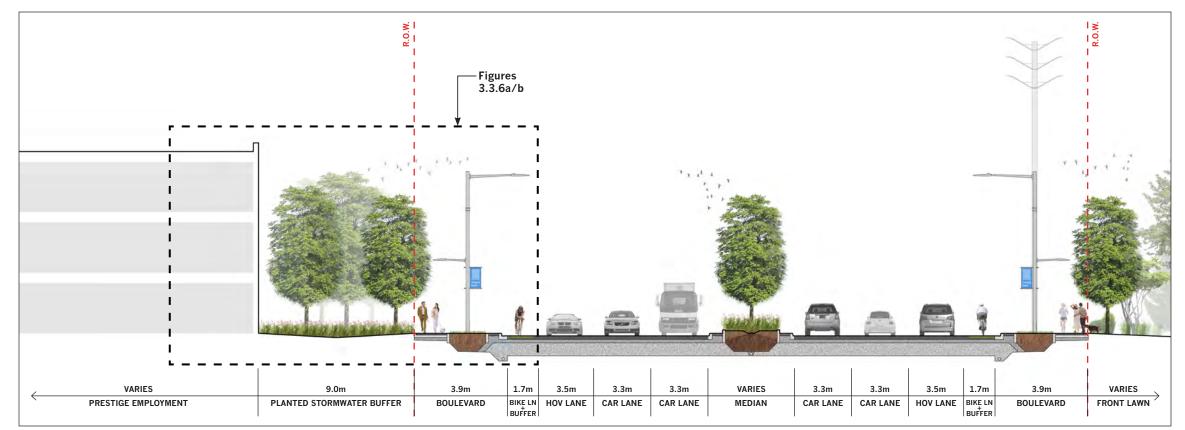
Keele Street streetscape concept section [Future prestige employment use].
